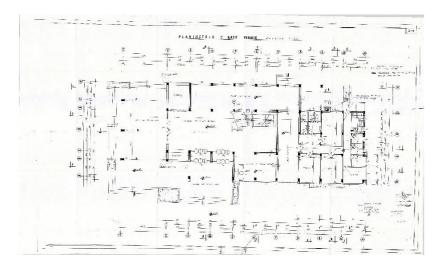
10. Plan of First Floor as it appears in the archives of The Museum (1973).
